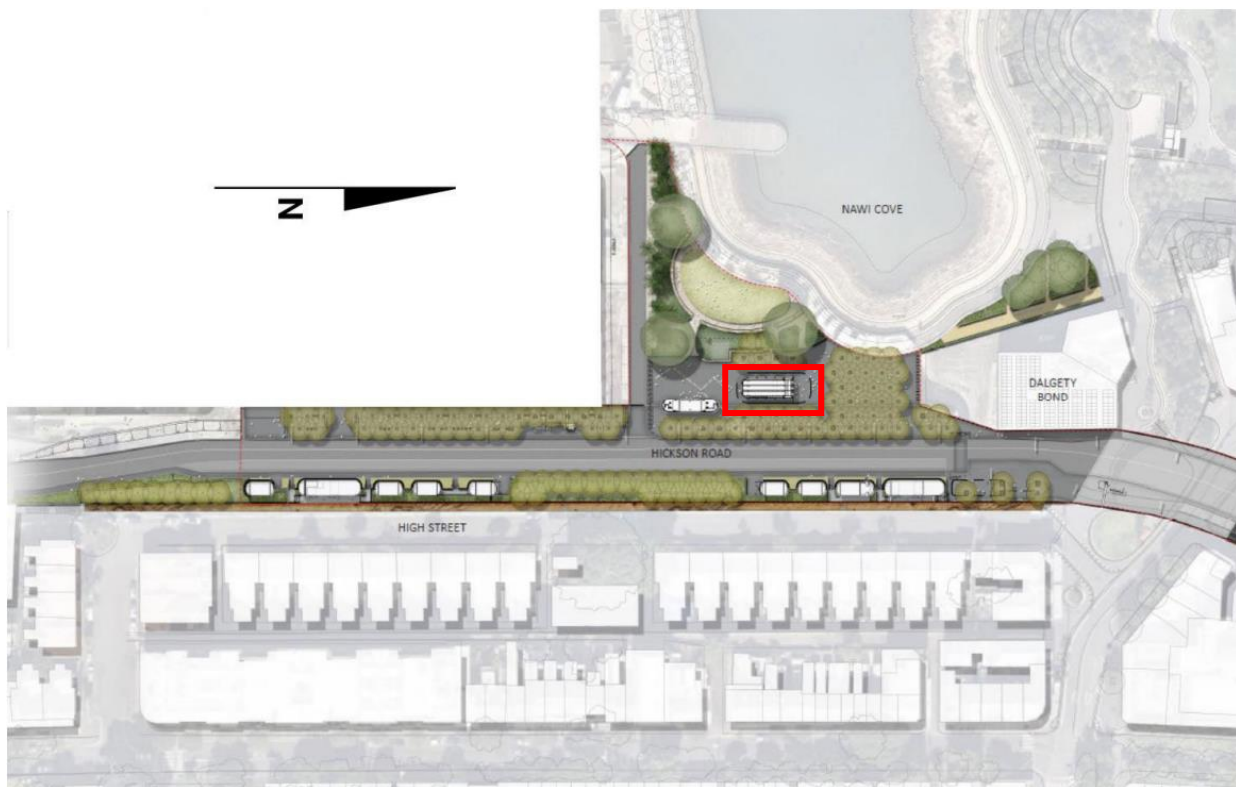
Location of Barangaroo Station (source: Barangaroo Station Construction Environmental Management Plan (CEMP), rev F)
